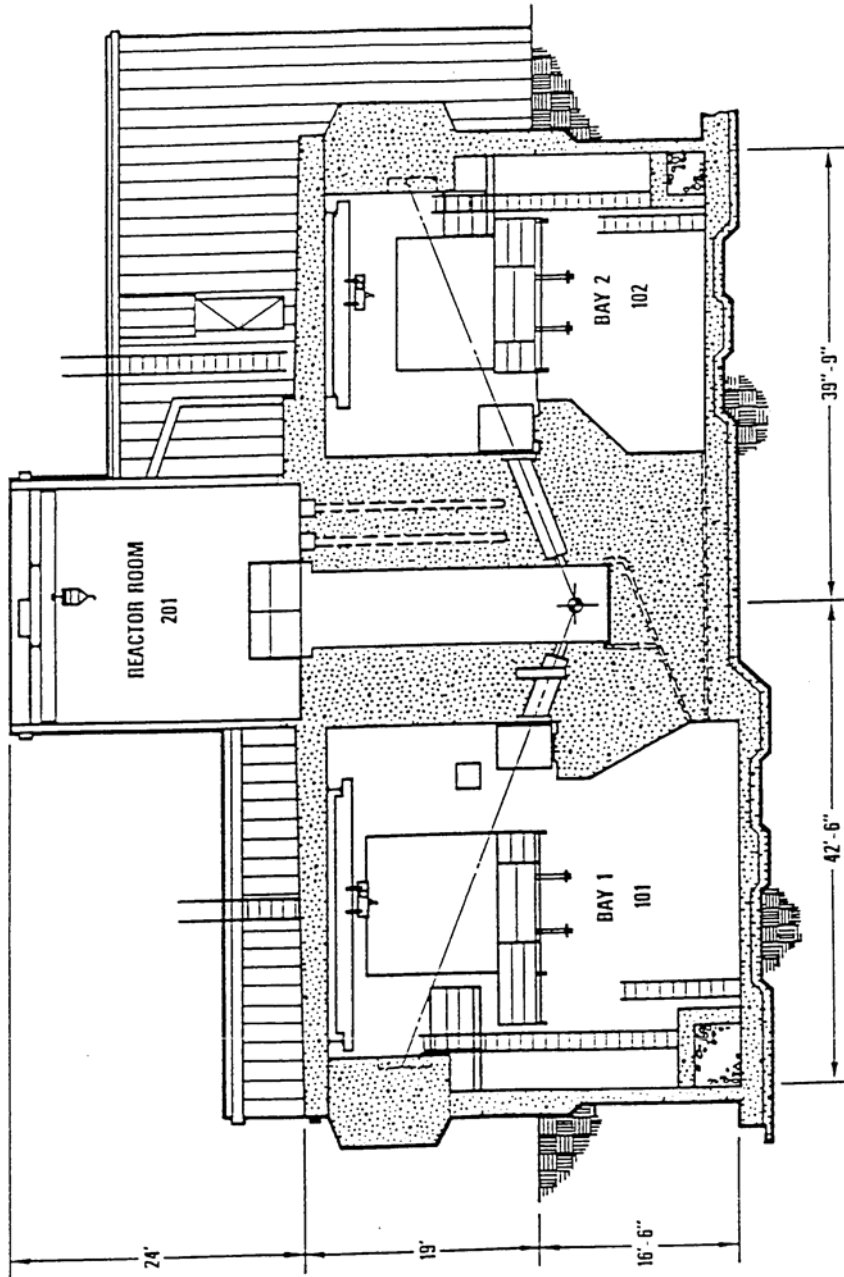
Cross Sectional View of MNRC Looking Into Bays 1 and 2
